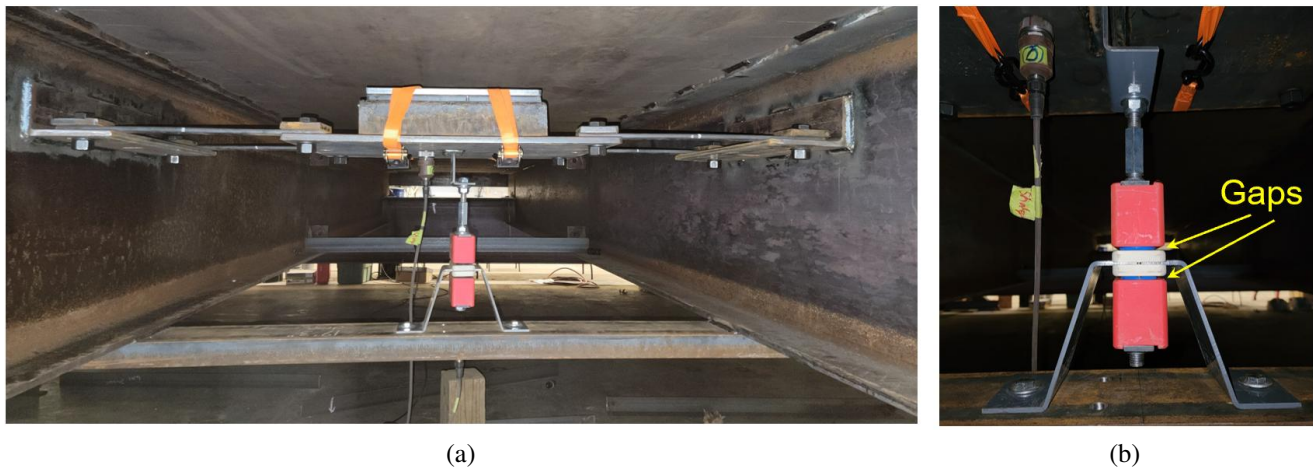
The TMD assembly after installation on Module 3: (a) view of the assembly with four spring strips; (b) the damper element, showing the elastomeric spheres separated by gaps
